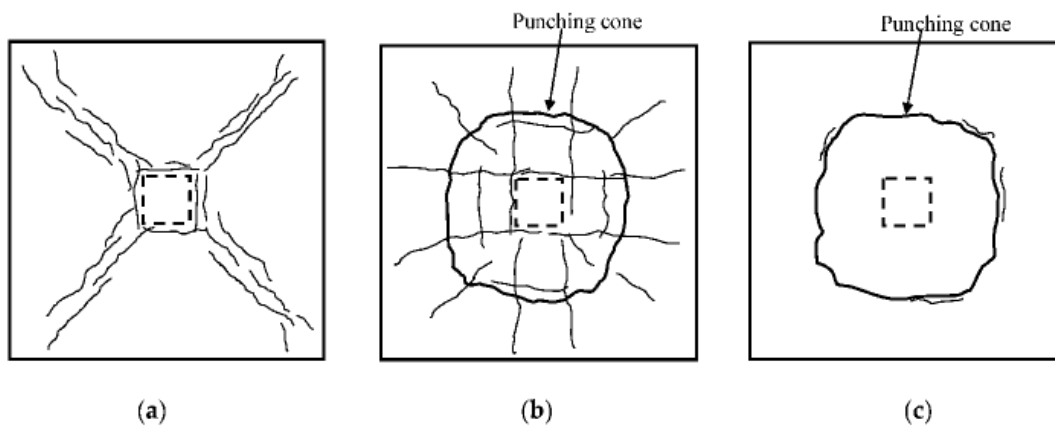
Typical cracking patterns on the tension surface of the slab:(a) Flexural failure (b) Punching shear failure of slab (c) Punching shear failure of retrofitted slab ( Chen et al., 2020 ).
